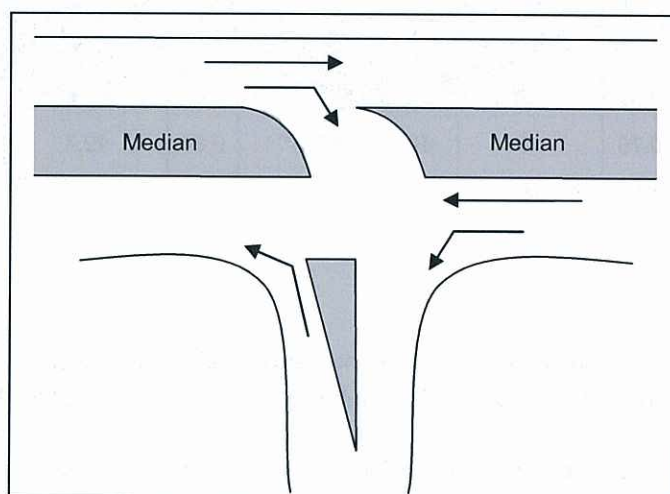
Beams Rd / Site Access Intersection Layout – Design Life
